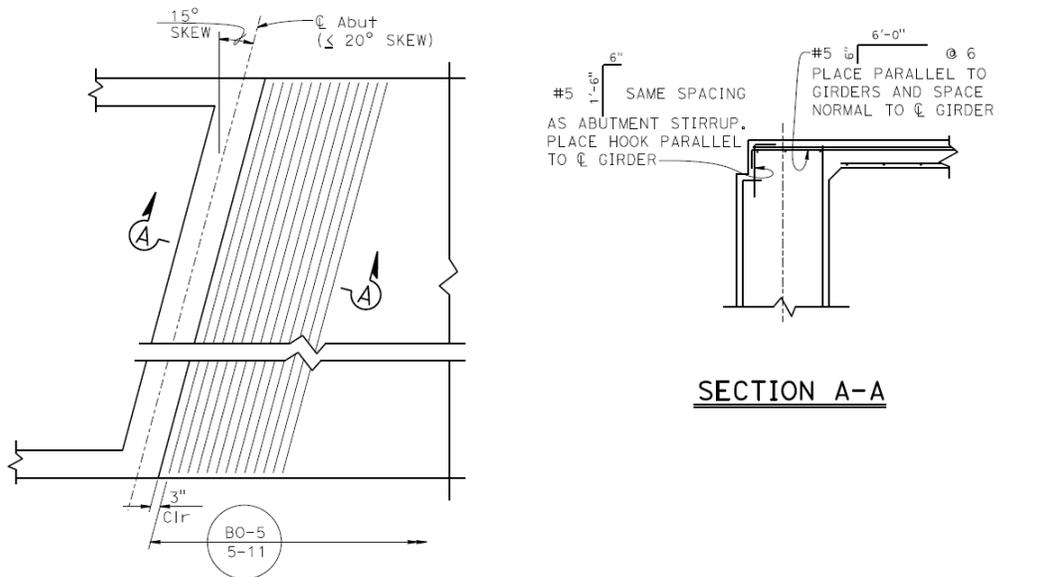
Transverse Deck Reinforcement Details at Abutment ($\leq 20^\circ$ Skew)
